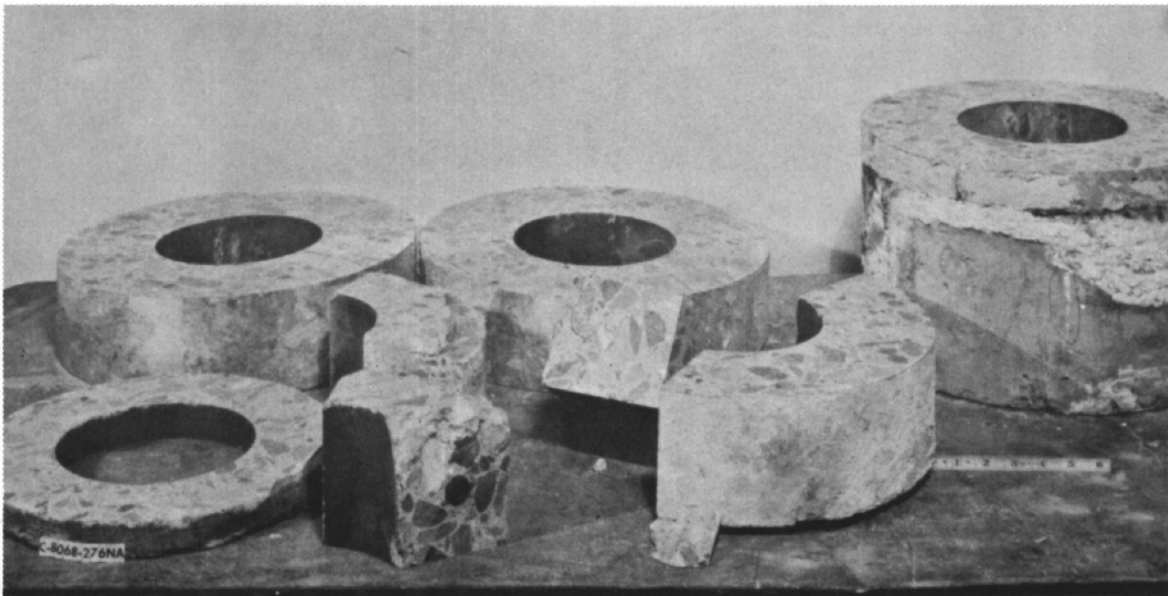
View of sawed concrete pipe section after about 180 days' exposure to the hot brine environment. Photo PX-D-55280 NA
